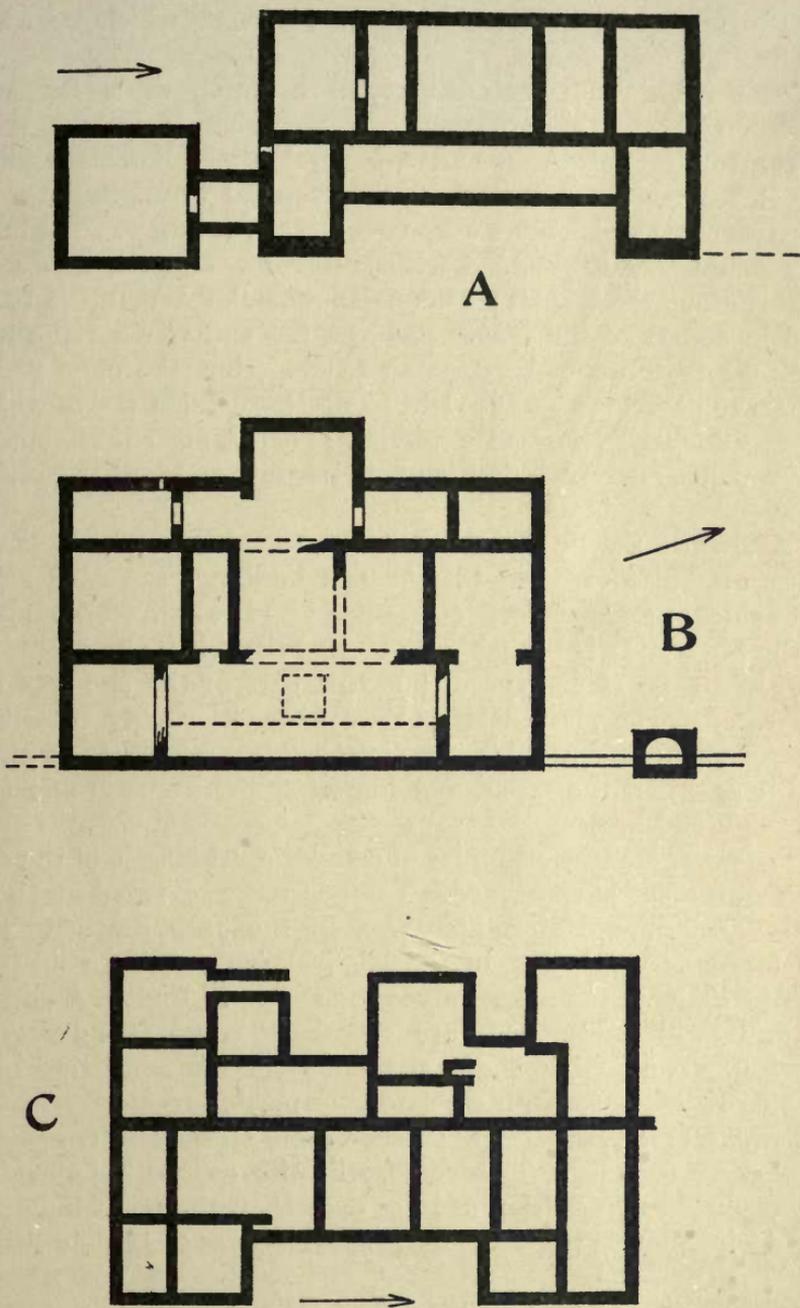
Plans of Houses at Mansfield Woodhouse, Chedworth and Ickleton.
